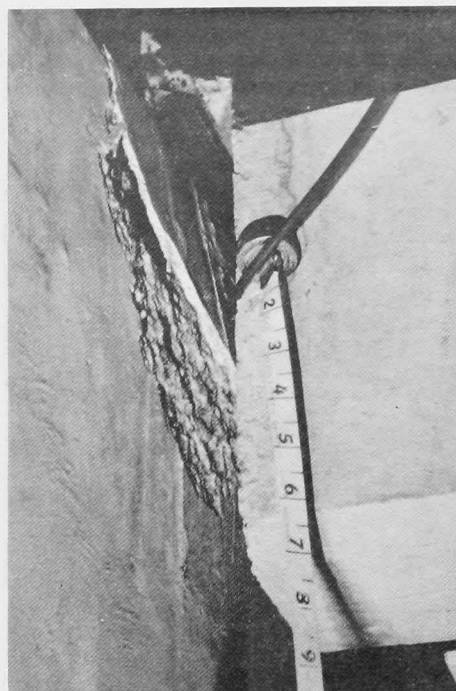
Beam being pulled off bearing wall by nearly 5 in. of swelling clay heave at college in Pueblo.
